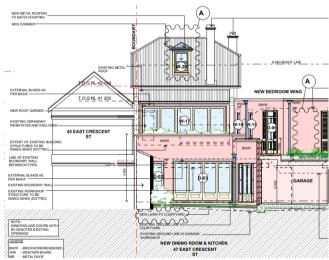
Proposed North Elevation of 47 East Crescent Street
